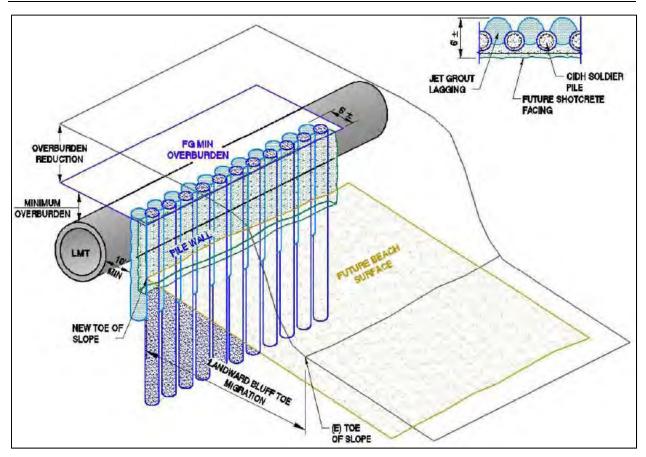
Isometric View of Reinforced Secant Pile Wall, reproduced from SPUR (2015).
